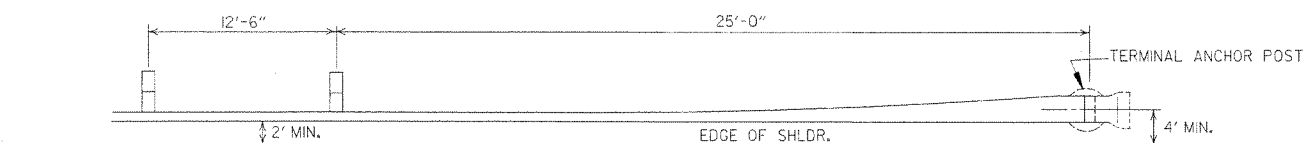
DETAILS SHOWING POSITION OF GUARD RAIL ON HIGHWAY
